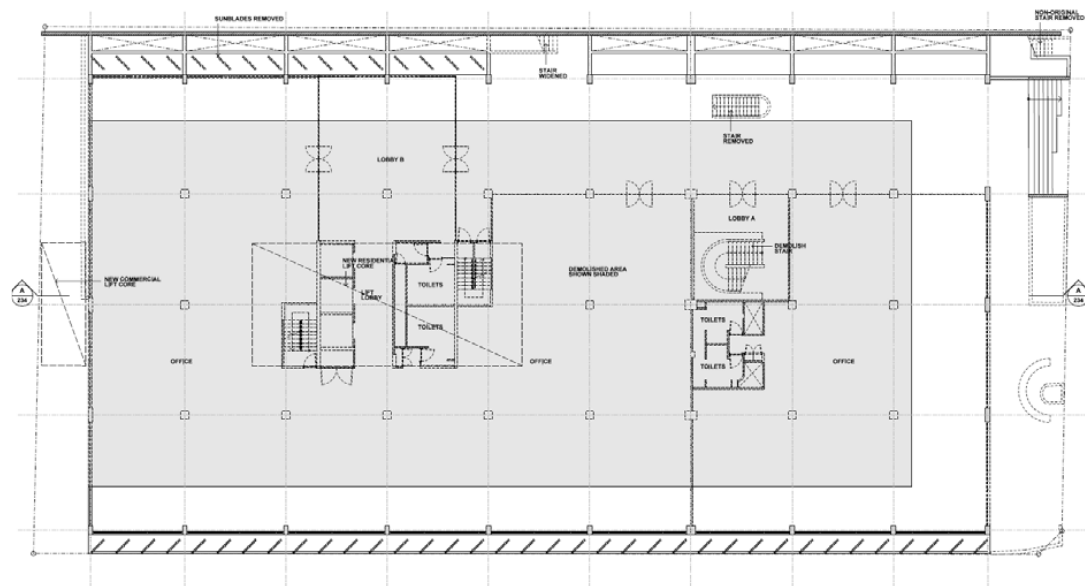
Ground floor plan showing extent of demolition & excavation (Harry Seidler & Associates)
